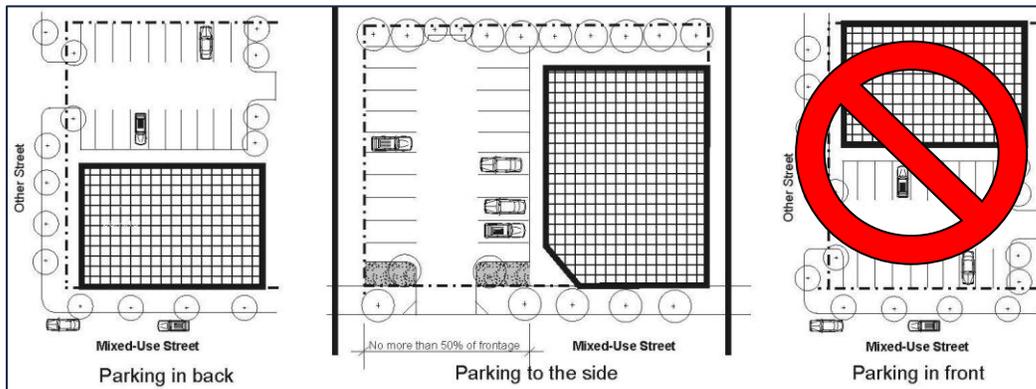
Off-street parking may be to the rear or side of a building but not in front.
